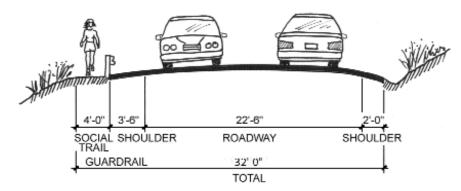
Existing Lincoln Boulevard at Washington Boulevard
